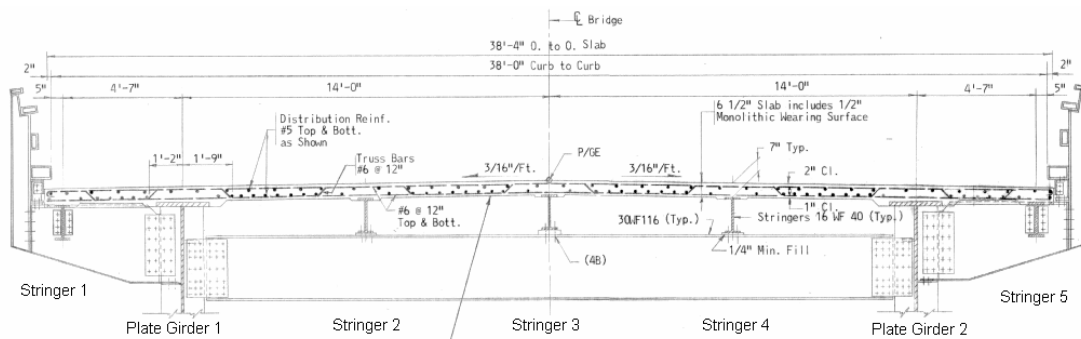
Continuous Steel Plate Girder Bridge Typical Section
